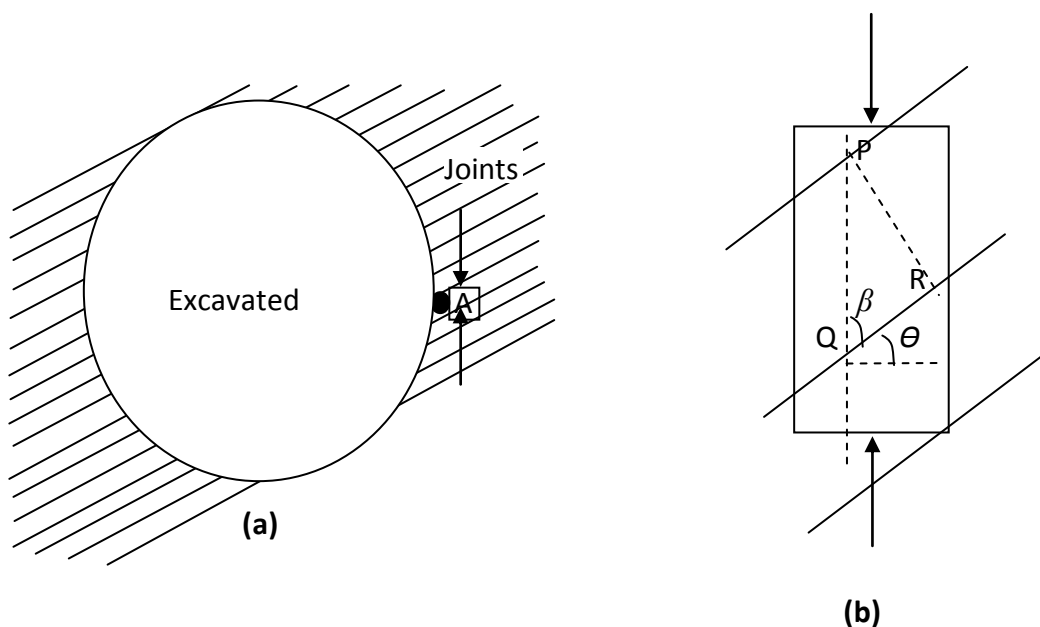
a) Loading on a Rock Mass Element 'A' Near Springing Level in a Circular Tunnel, b) Enlarged Element 'A'
